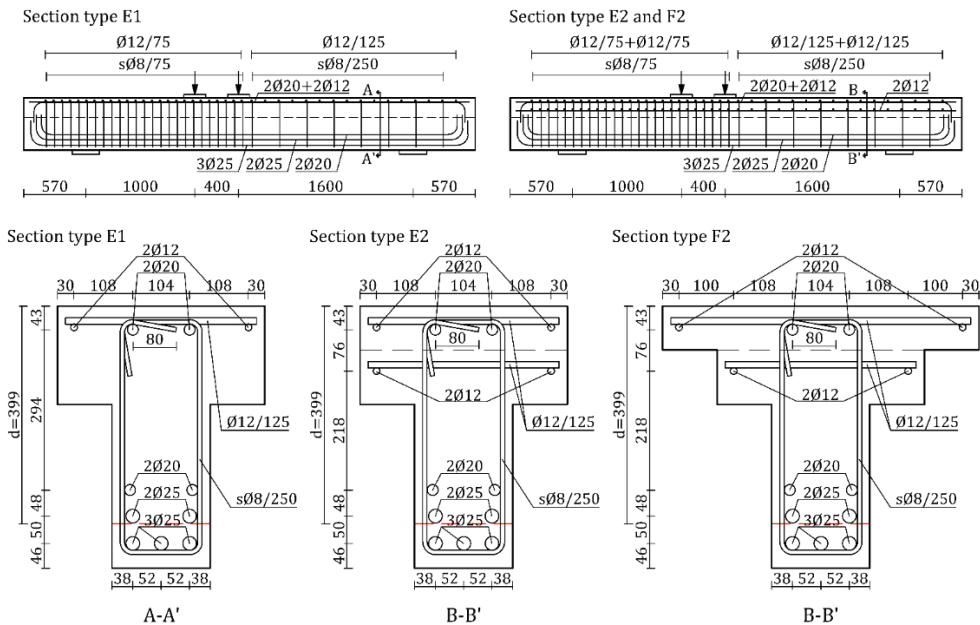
Dimensions and reinforcement of specimens types E and F (dimensions: mm).
